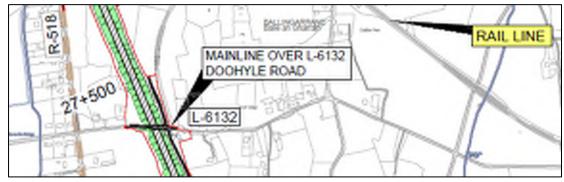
Bridge Proposed over Local Road L-6132 at Graigeen (as per November 2018 Design Update)
